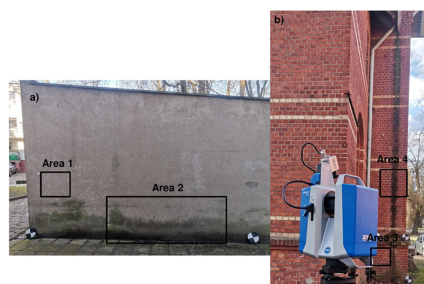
Tested external walls of the buildings: (a) object 1, (b) object 2.
